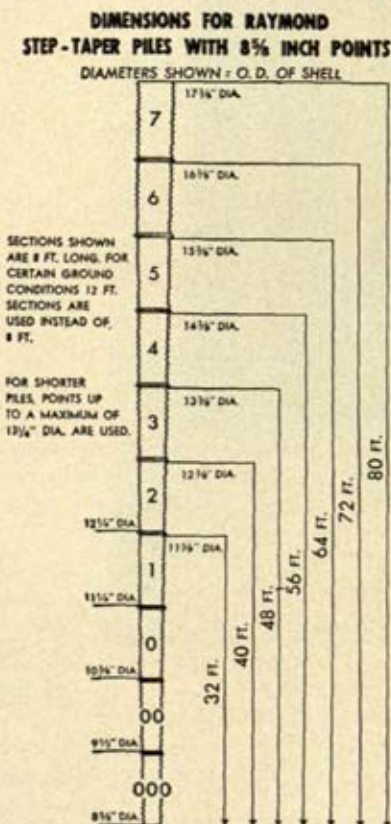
Dimensions for Raymond step-taper piles. (Raymond Concrete Pile Co.)
